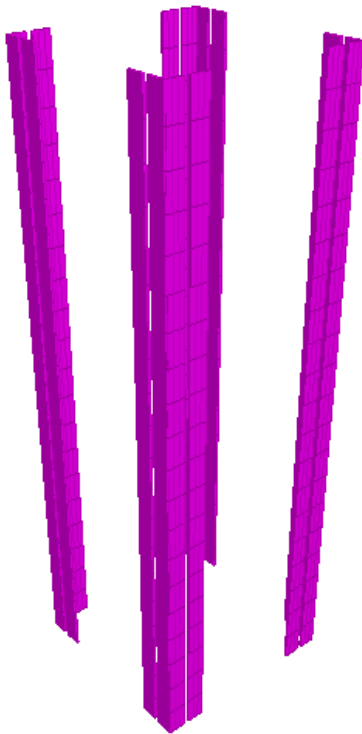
Shear wall at periphery with 14.2 % opening (Case OSA3)
